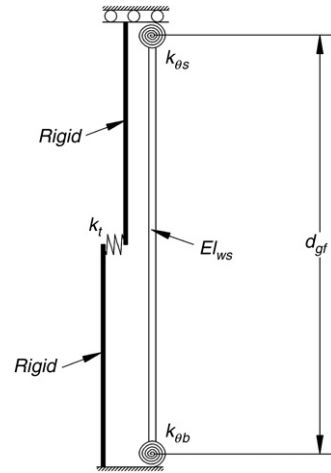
Model for the transverse deformation of a steel *I*-girder at a support.
